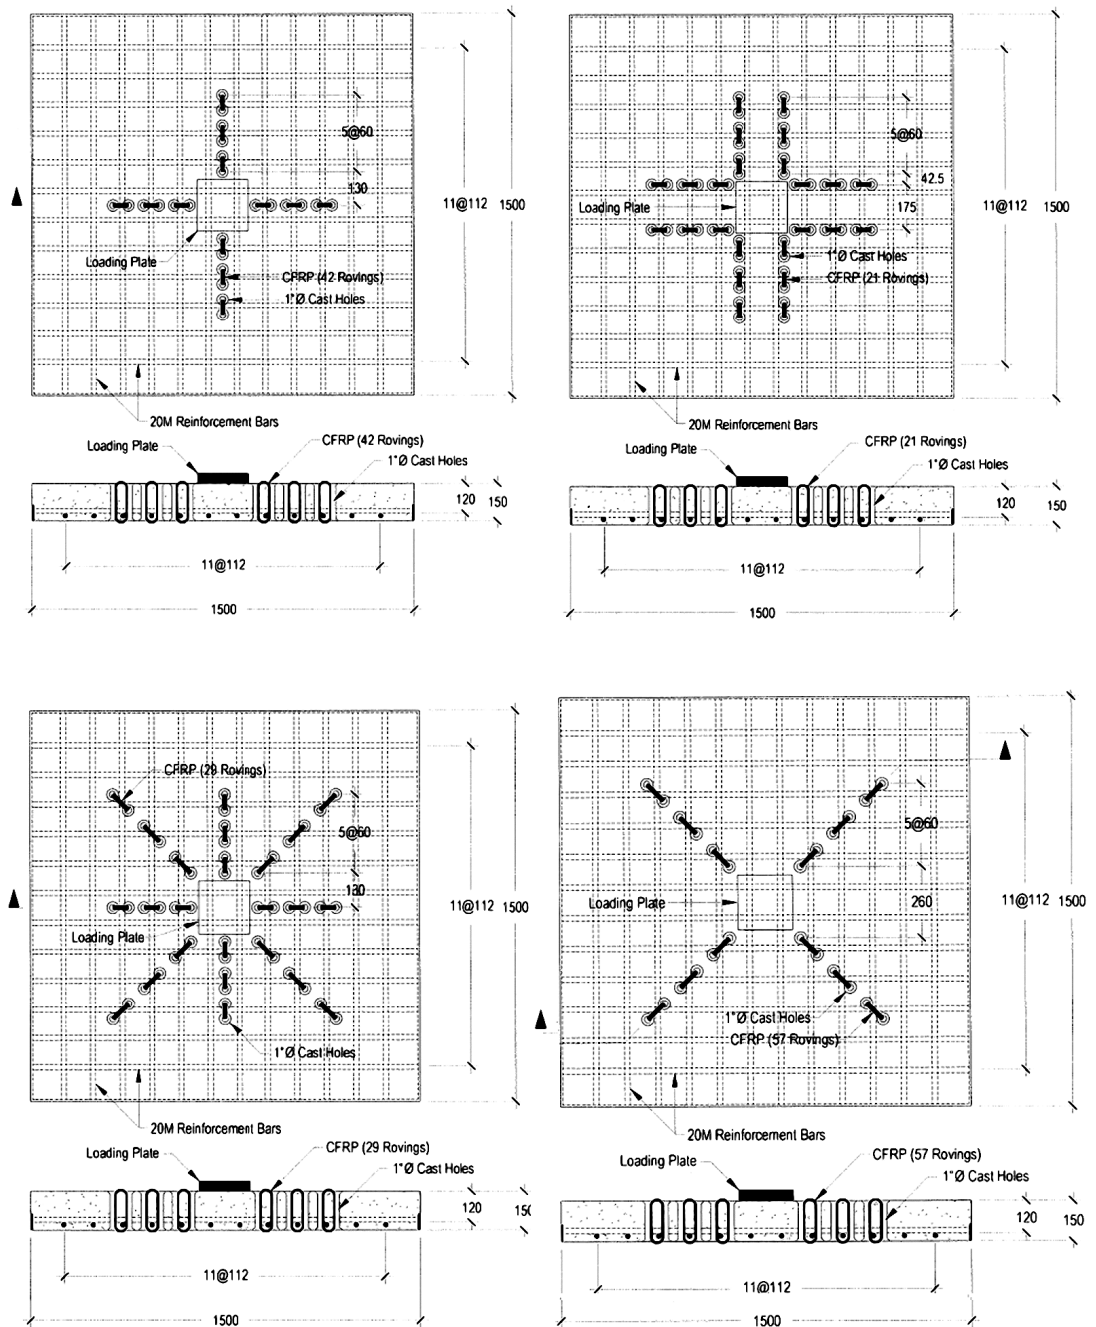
Test specimen details adopted from Sissakis (2002)
